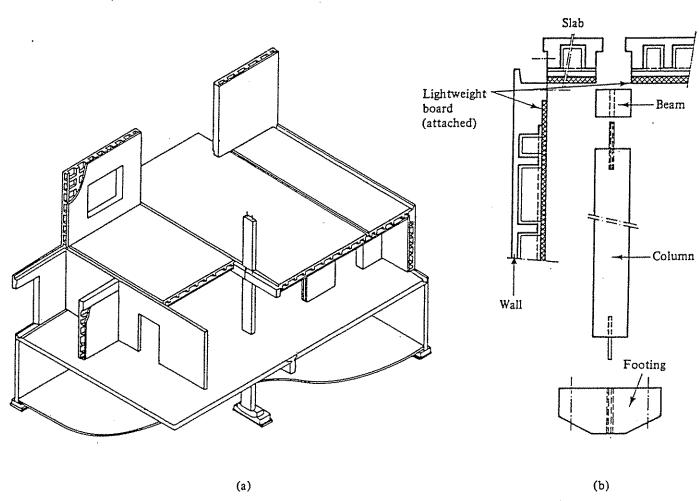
The Opera system (France): (a) general scheme and (b) schematic details of elements and connections.
